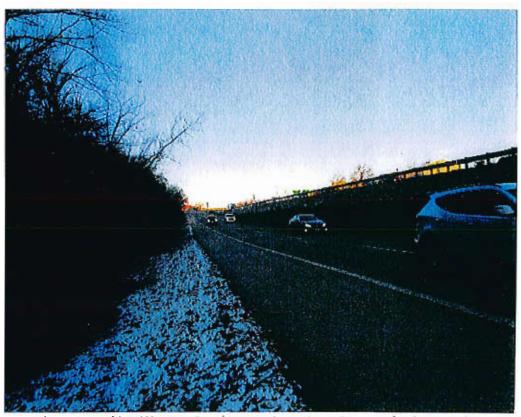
Looking West on South Outer Forty From Proposed Drive Location
